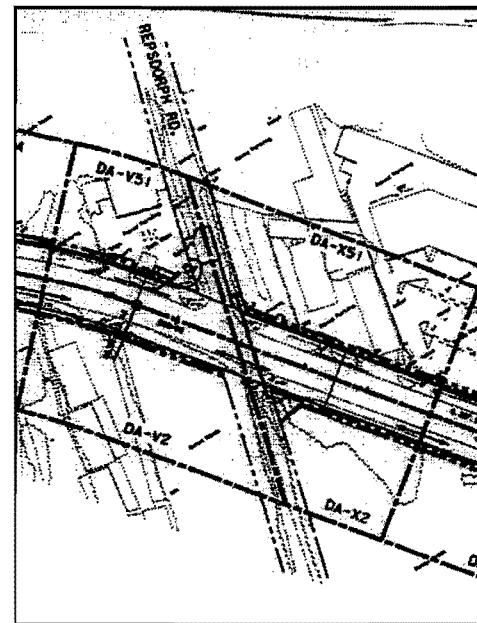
NASA Rd. 1 Test Site Cow Bayou Portion
